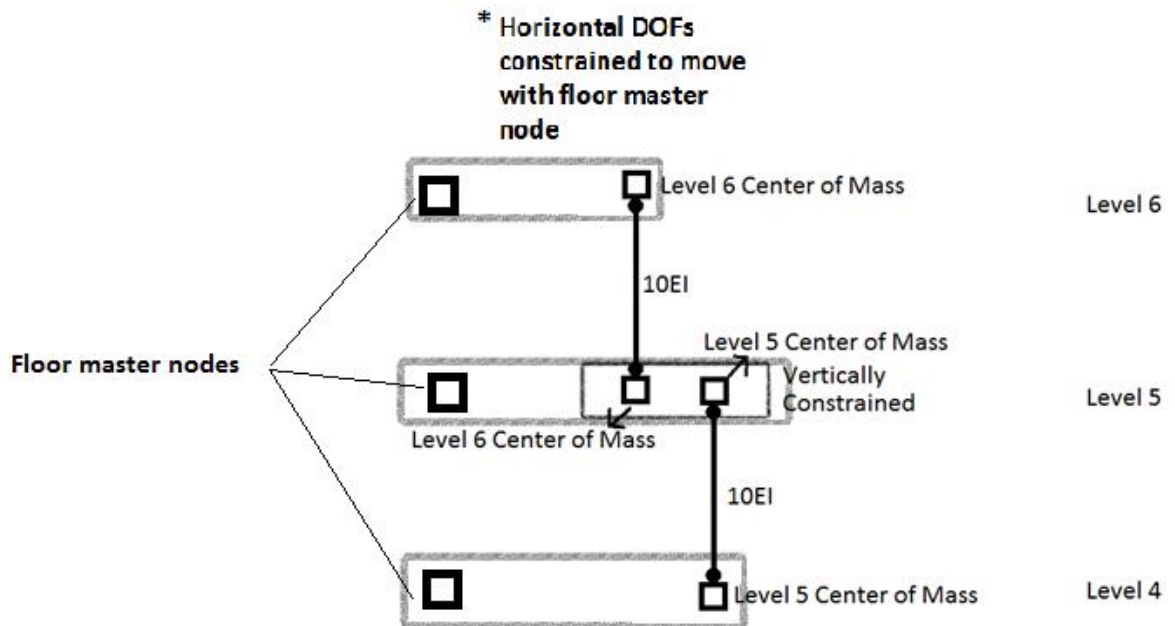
Elevation of Levels 4 to 6 “Dummy” Columns
